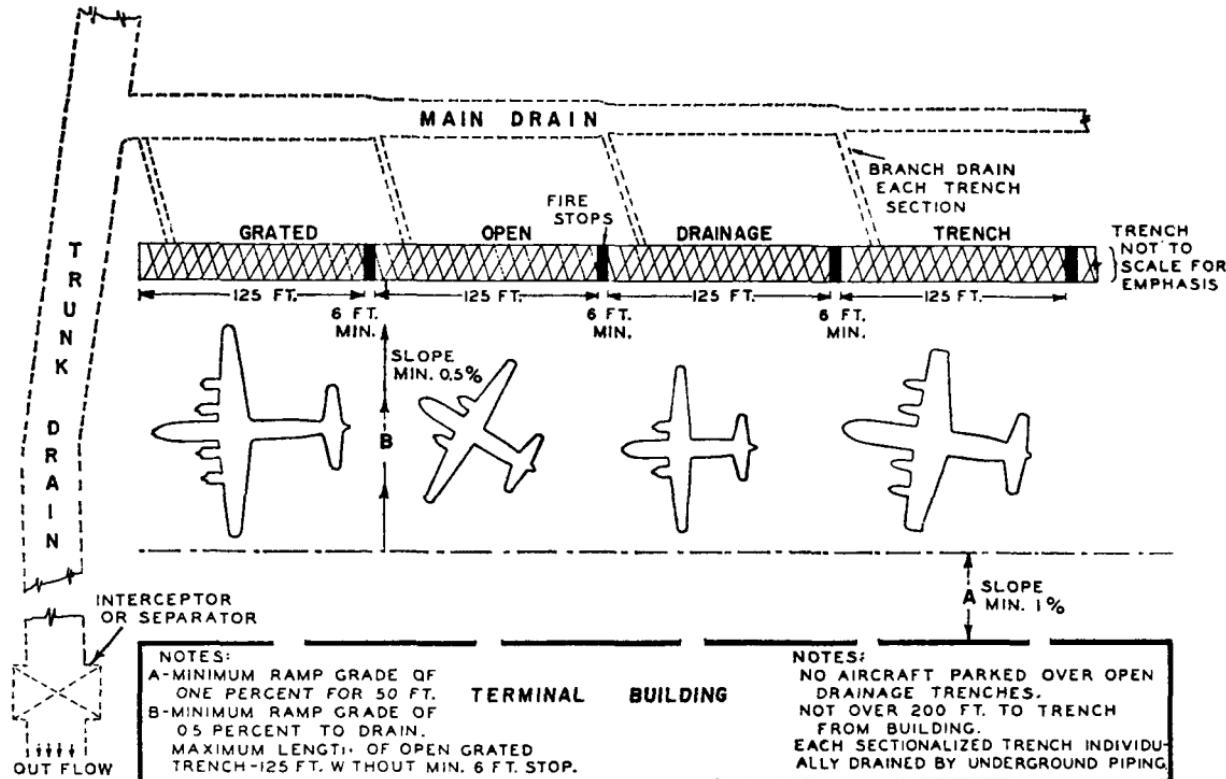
(b) Another possible arrangement of an aircraft fueling ramp drainage system using a grated open drainage trench.
